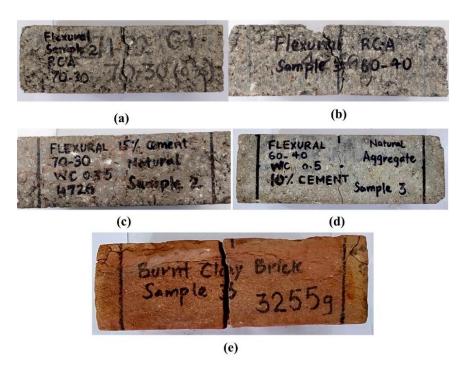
Failure modes of bricks under three-point bending test (a) RAC-70C30F brick (b) RAC-60C40F brick (c) NAC-70C30F brick (d) NAC-60C40F brick (e) Burnt clay brick.
